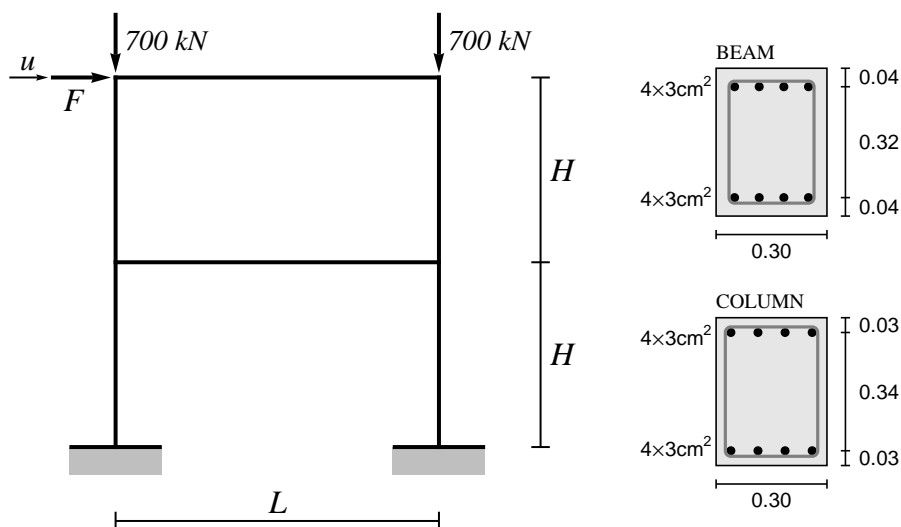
Two story frame: geometry, loading pattern and cross-sections.
